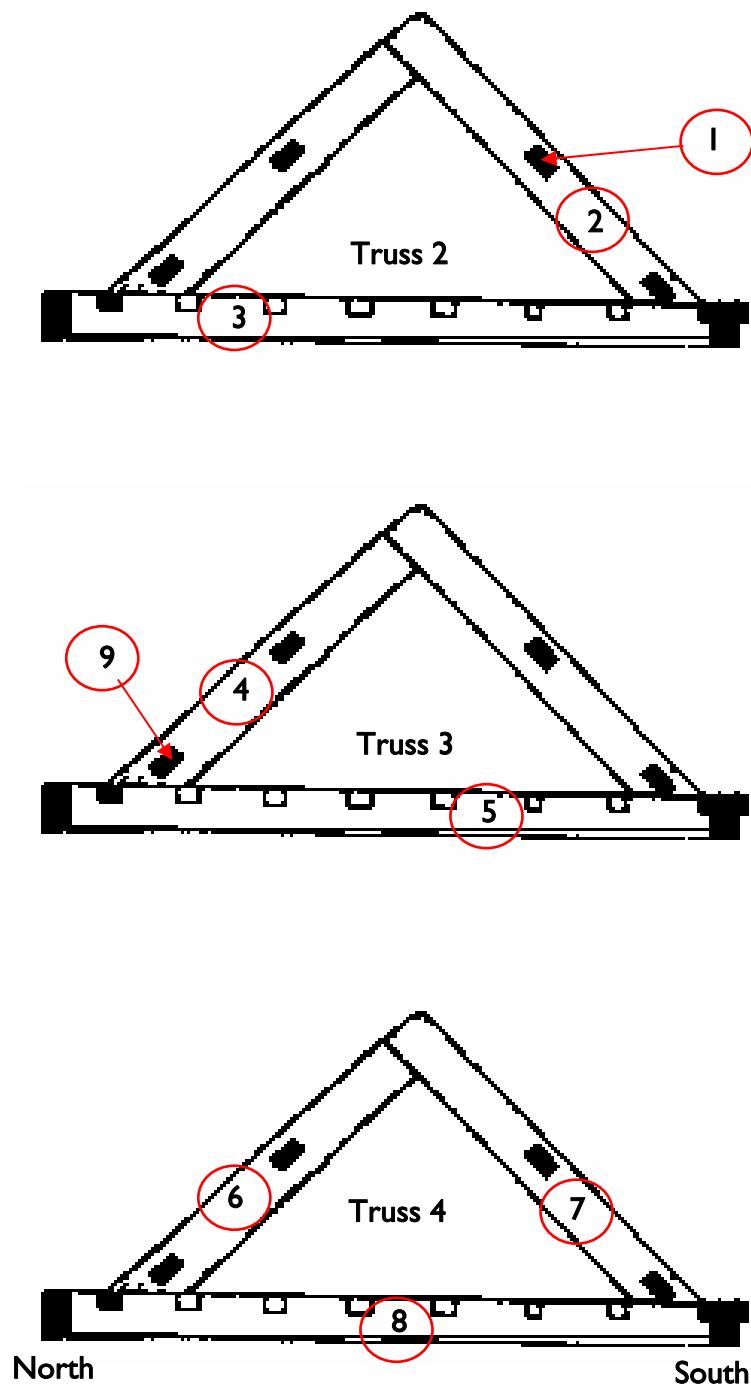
Plan to show location of the trusses (after Richard Parker, Exeter Archaeology)
